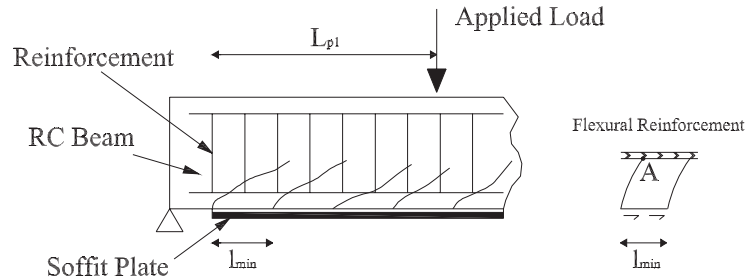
Concrete tooth model. Cracked beam and concrete tooth between two adjacent flexural cracks.
